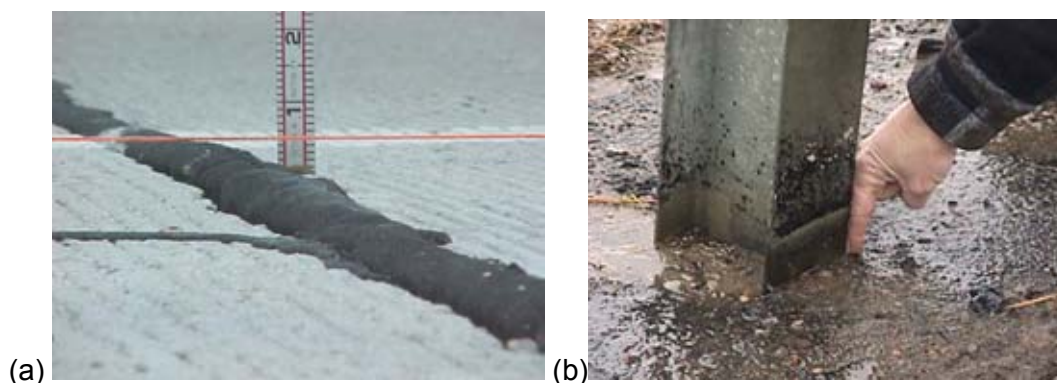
(a) Settlement at bridge approach slab and concrete pavement joint (b) Settlement at bridge end illustrated at guard rail post, Bridge A-4811, District 10, Jackson, MO.
